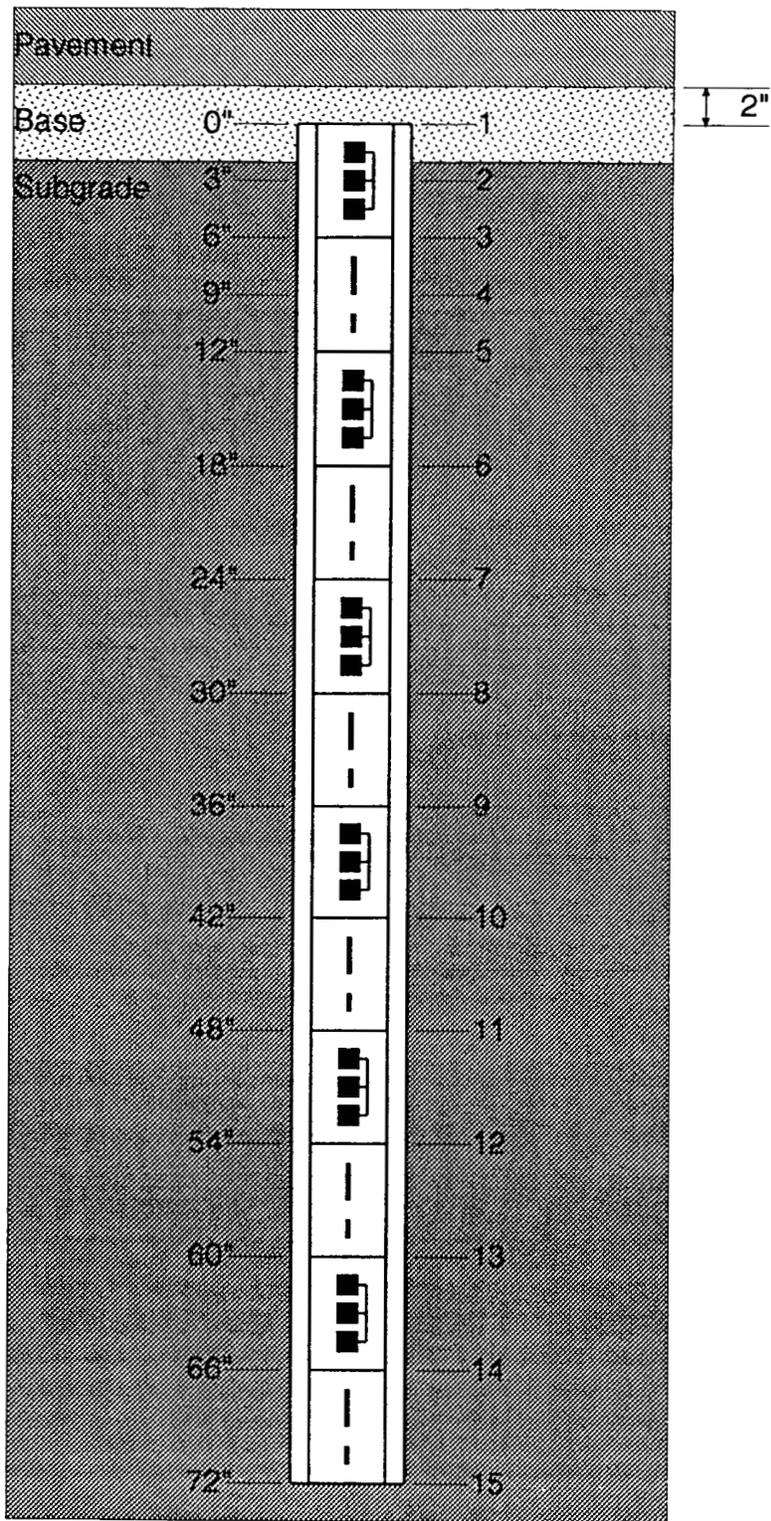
Typical MRC Thermistor Probe Assembly.
